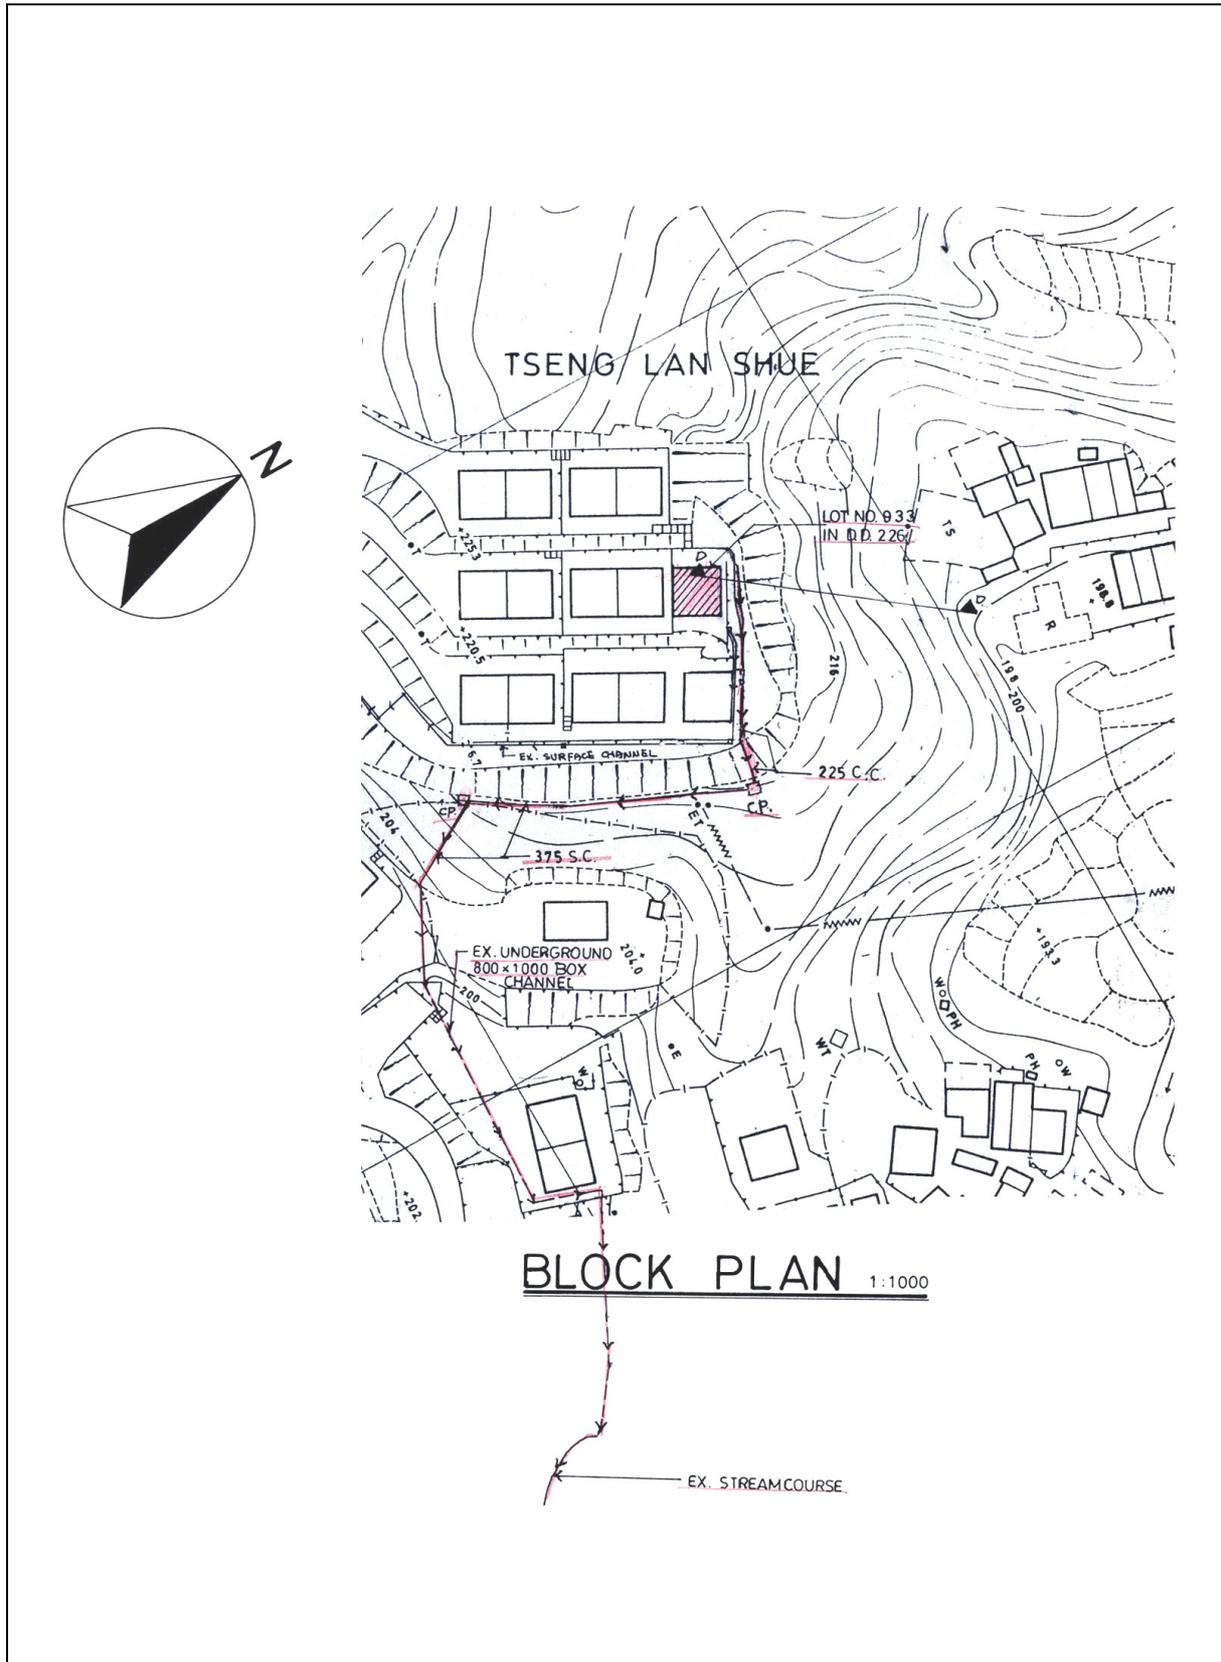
Plan Showing the Location of the Designed Cross-section (D-D) and the General Surface Drainage Layout (Extracted from Approved Plan, Drawing No. SF-1, for No. 56 Denon Terrace)
